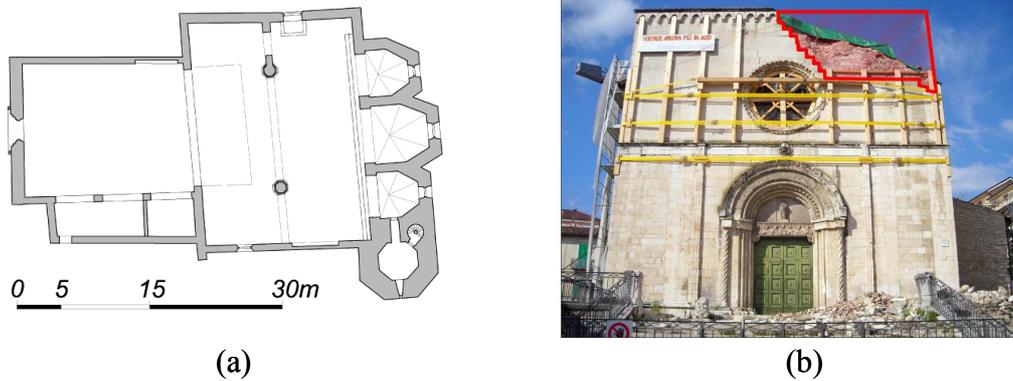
St. Pietro di Coppito church: plan (a); damage at the façade (b)
